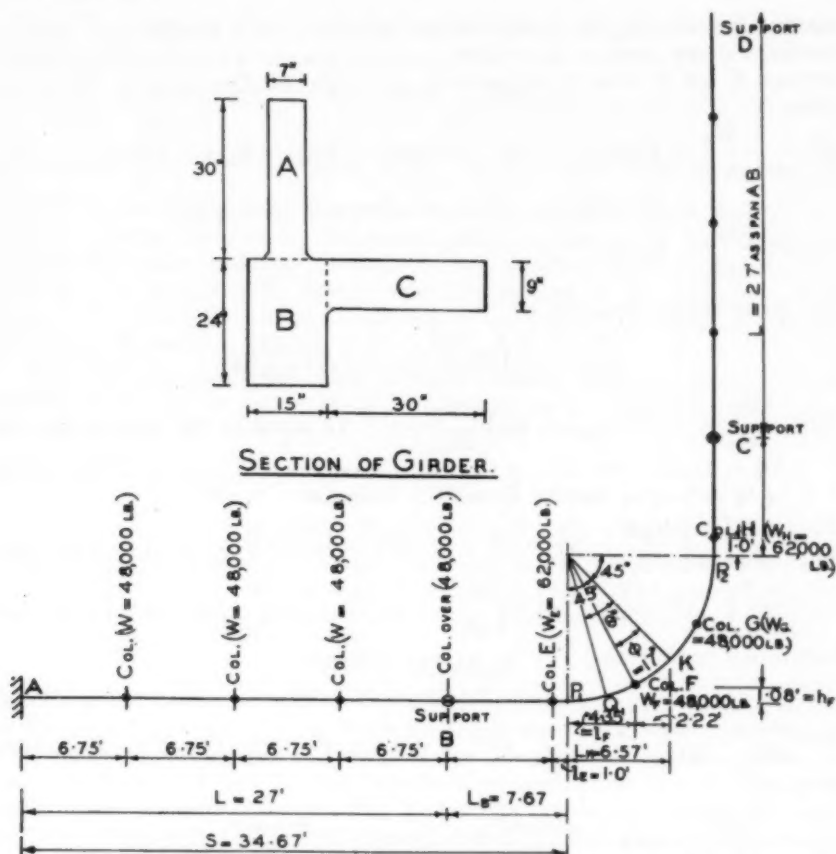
Plan and Cross Section of Girder and Adjoining Beams.
